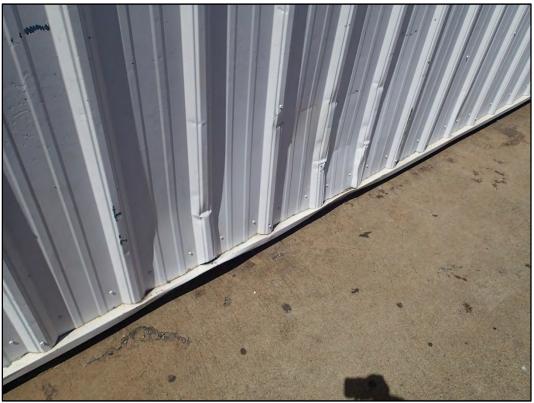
View of previous damage to corrugated metal wall panel at Building 143.
